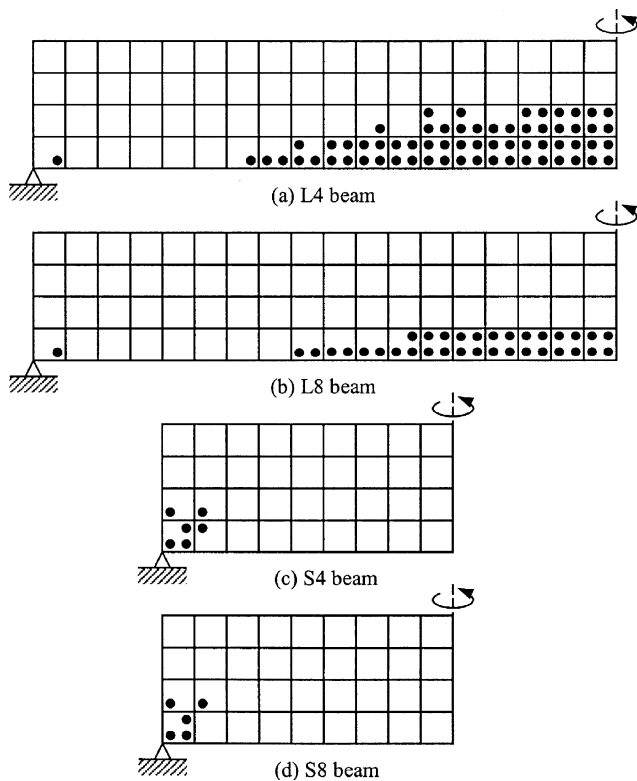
Crack patterns of reinforced concrete beams without strengthening FRP and under ultimate loads.
